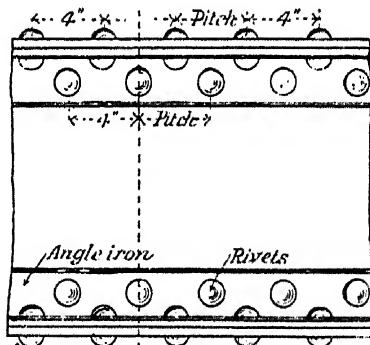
Part Elevation of a Built-up Wrought-iron or Steel Girder.
